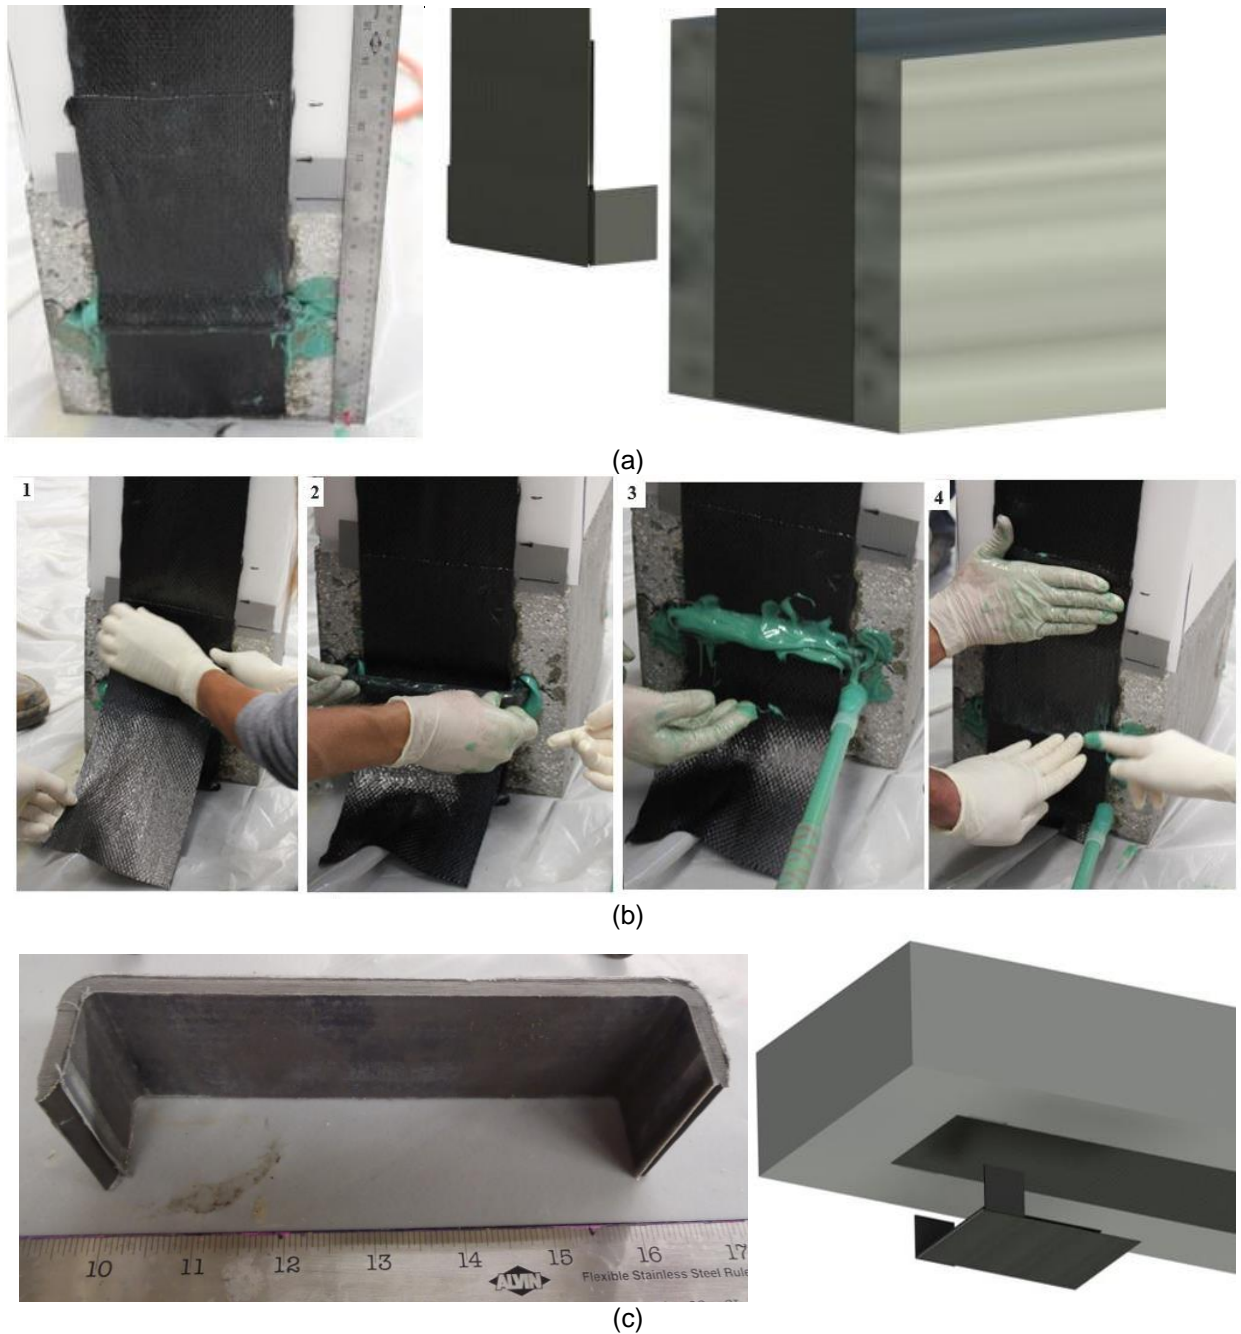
Anchor solution under evaluation: a) schematic of installation; b) installation steps on concrete substrate; and c) staple anchor (left) and schematic of installation for flexural strengthening on concrete slab element (right)
